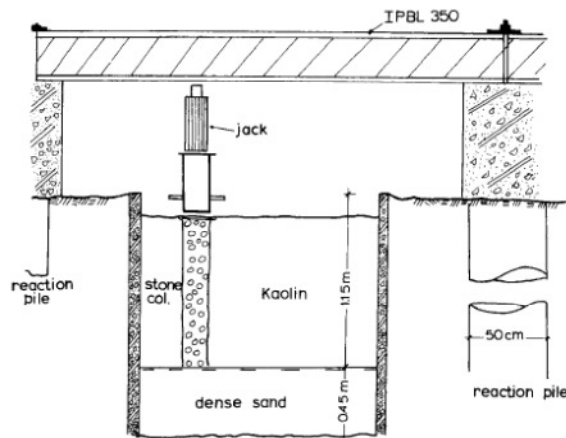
Cross section of test pit with the stone column and the load application system (Christoulas, 2000)
